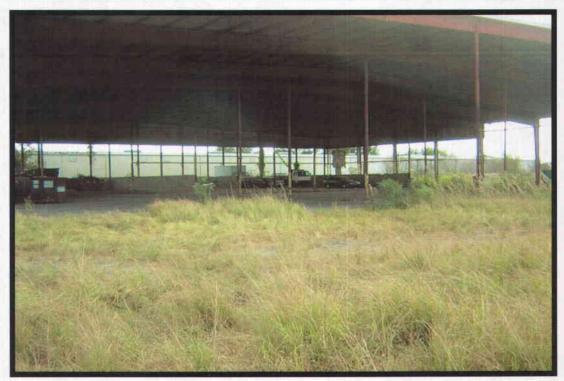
A view of the site facing South across the front of the 2-story open building. (11/08/06)
